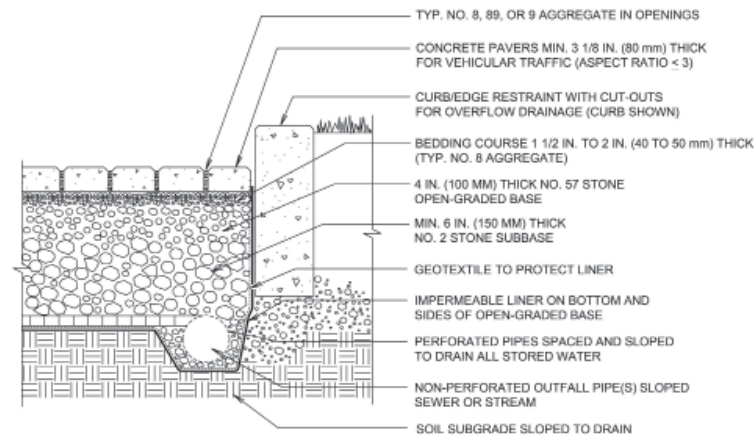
A cross-section detail from a permeable pavement system. This design includes an impermeable liner to prevent infiltration and a perforated pipe underdrain system for exfiltration. This is a common design feature where infiltration is not allowed. (Source: Aquafor Beech)
